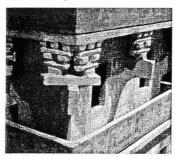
A. Corner block-bracket set of five-storeyed building, mid-Easter Han. Excavated in 1972 at Jiaozuo (photo taken by author at Henan museum).
